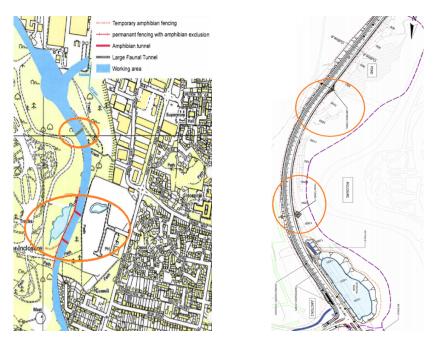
Proposed amphibian tunnels, annex plan (left), detailed plan (right) (Ecological Mitigation Plan, Nov. 2015)
